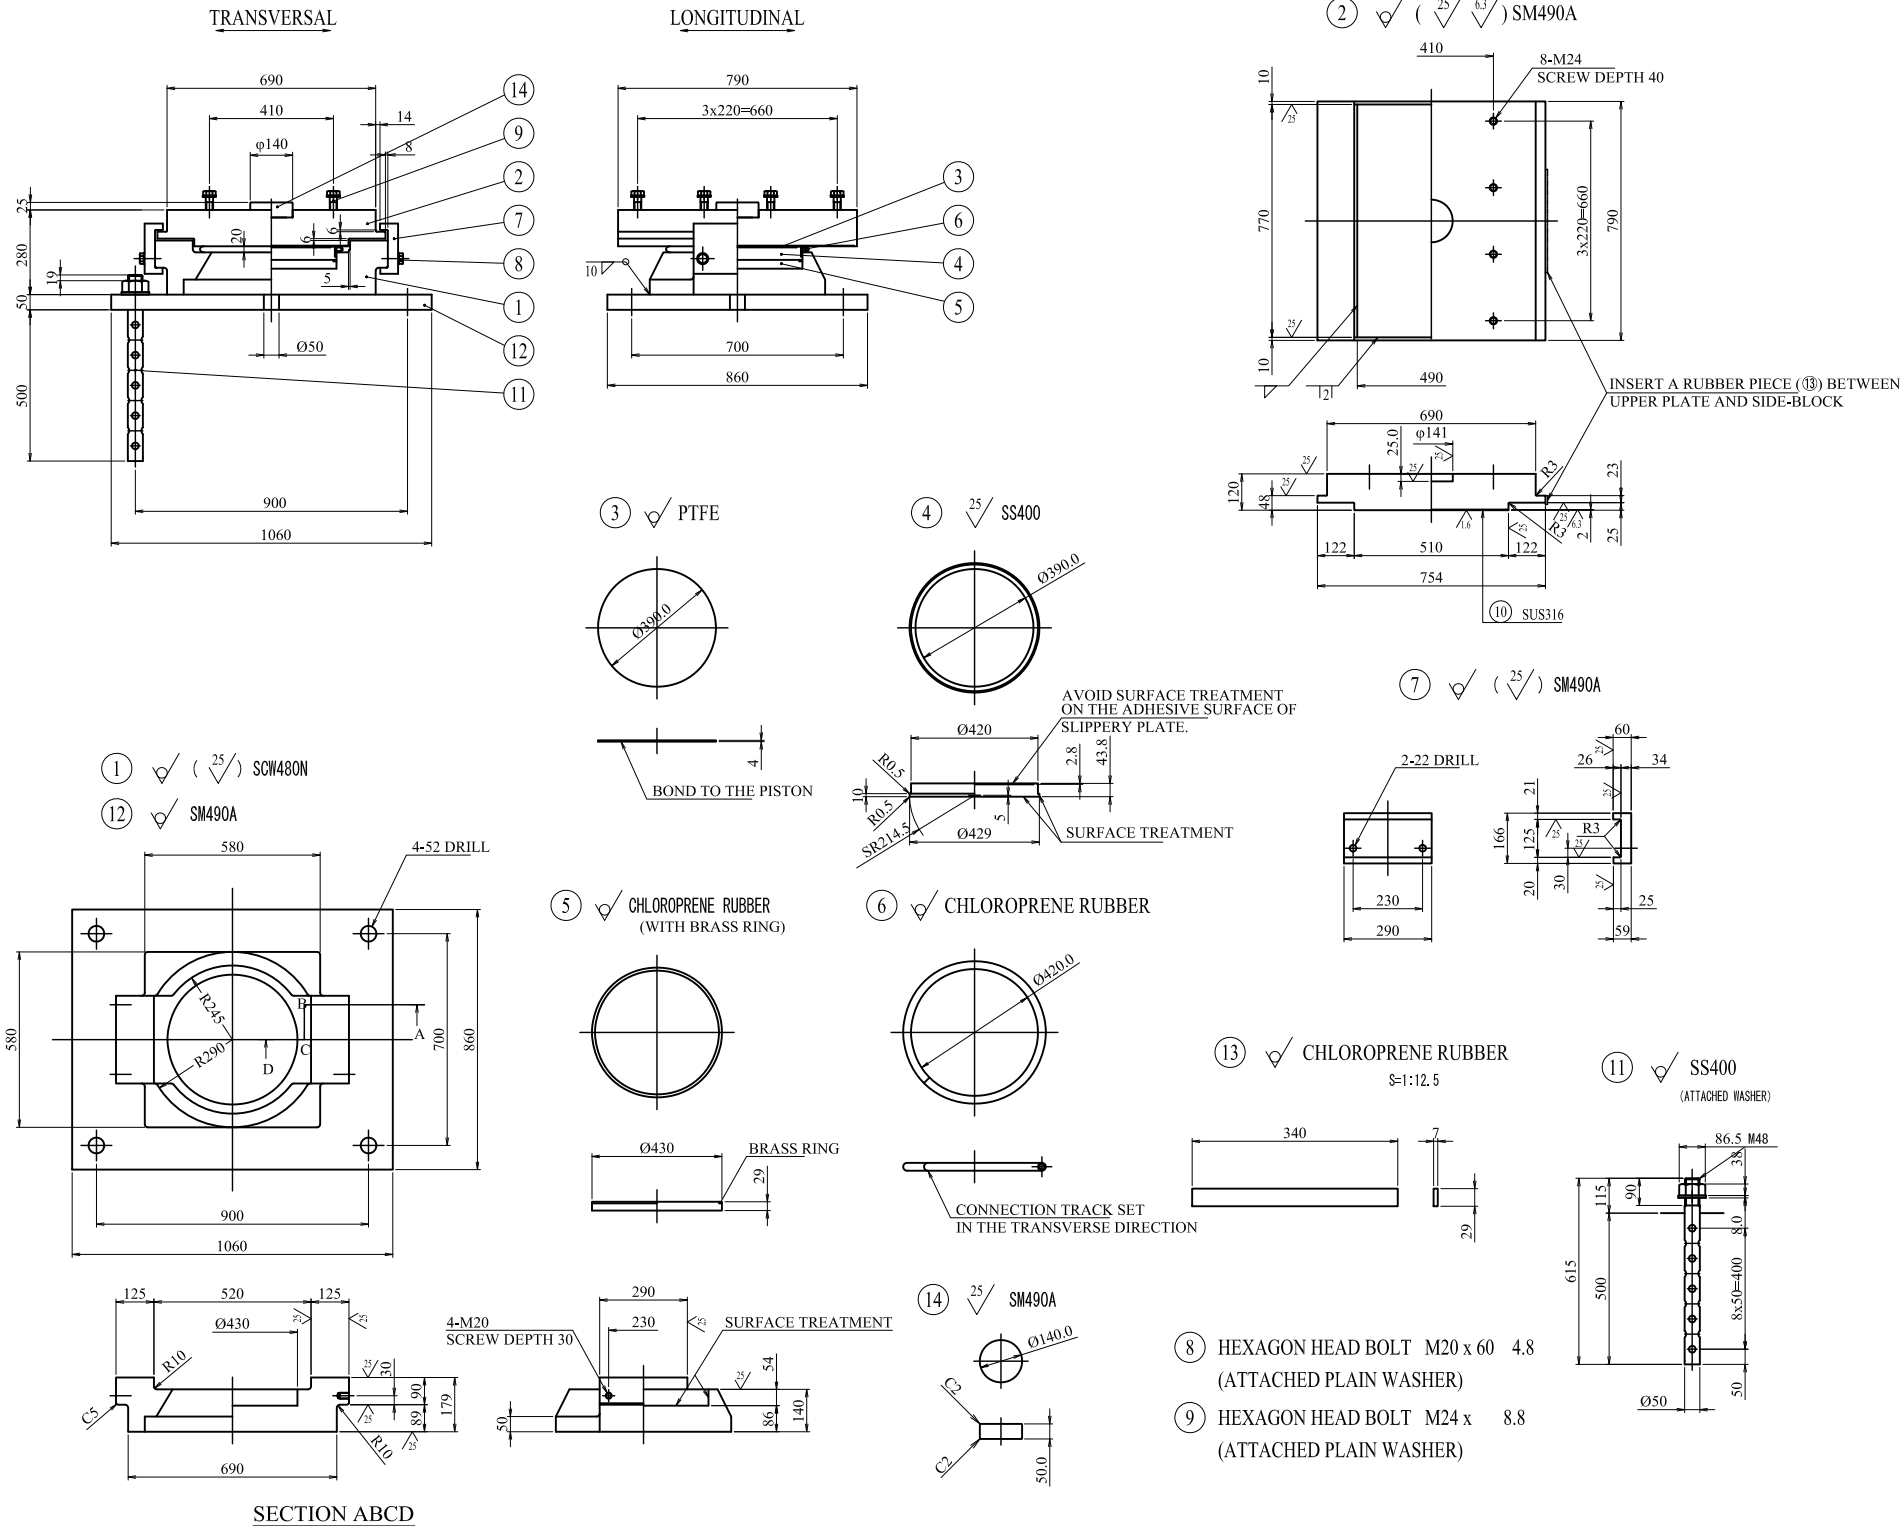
# DETAIL OF STEEL BEARING (MOVABLE TYPE, P13) (1) S=1:25
